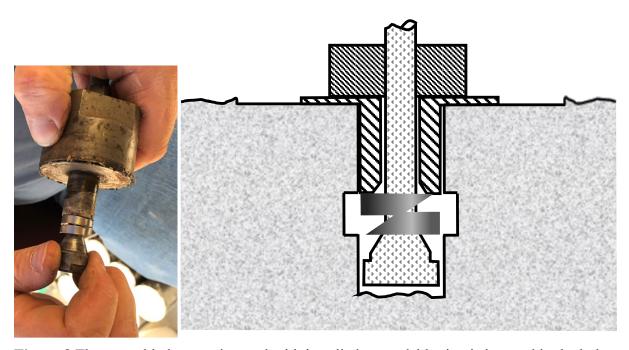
The assembled expansion tool with installed expandable ring is inserted in the hole.
